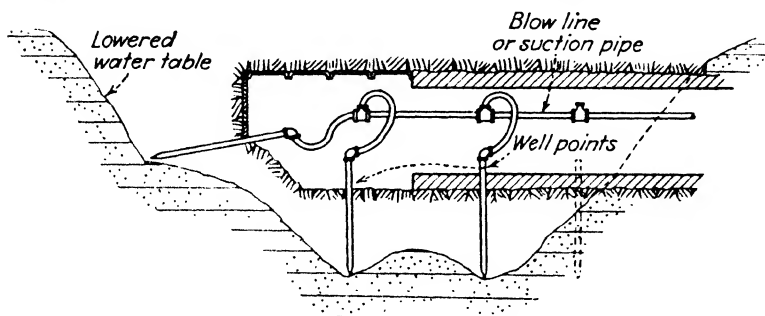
Draining ground at face of tunnel by well points driven from the heading.
